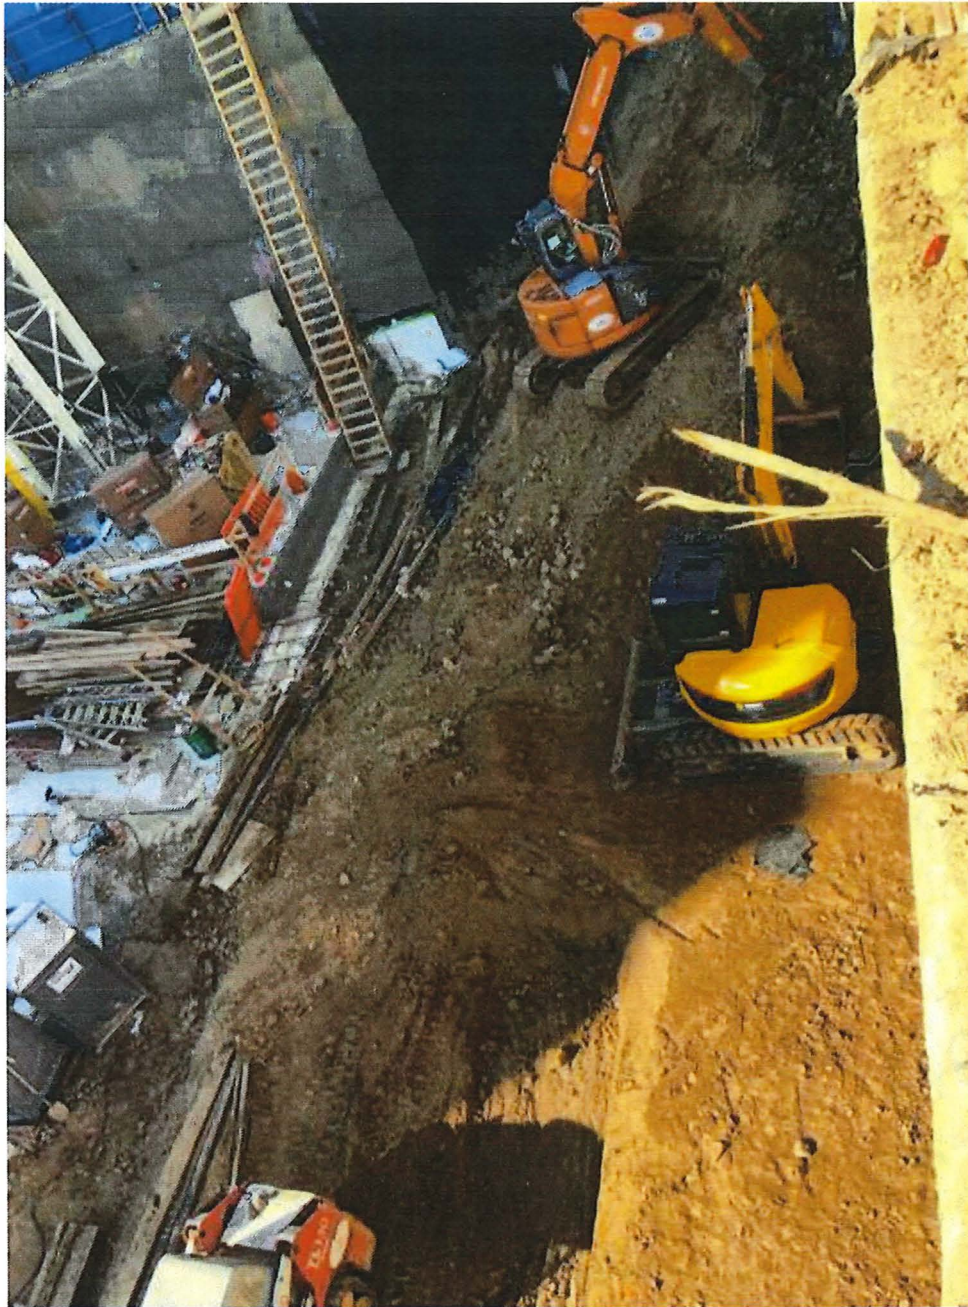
390 1st Street Excavation of sandstone with no hoe-rams. All equipment shown is <63hp (Demolition, Excavation and shoring 28,000 CY)
